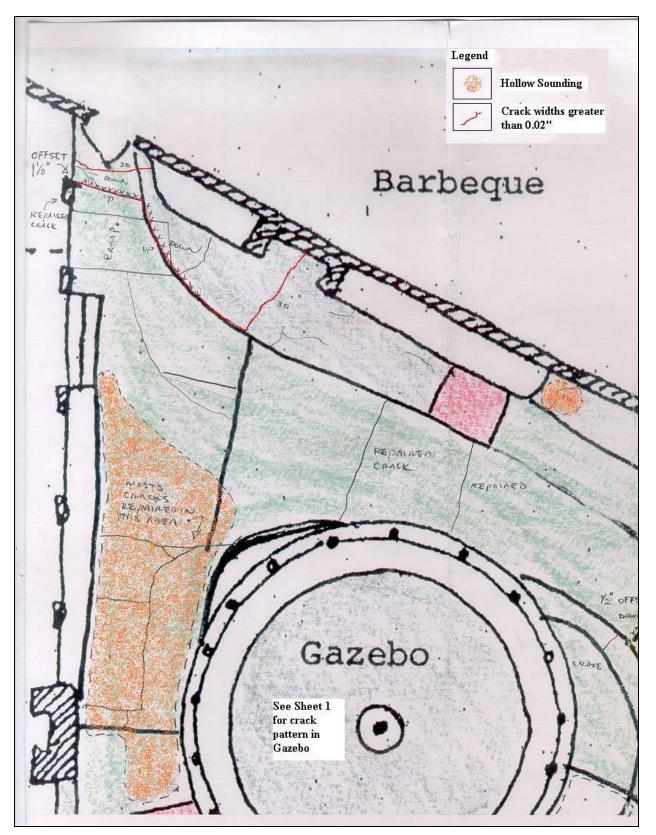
Section F -- Northwest corner section (North of Gazebo)
